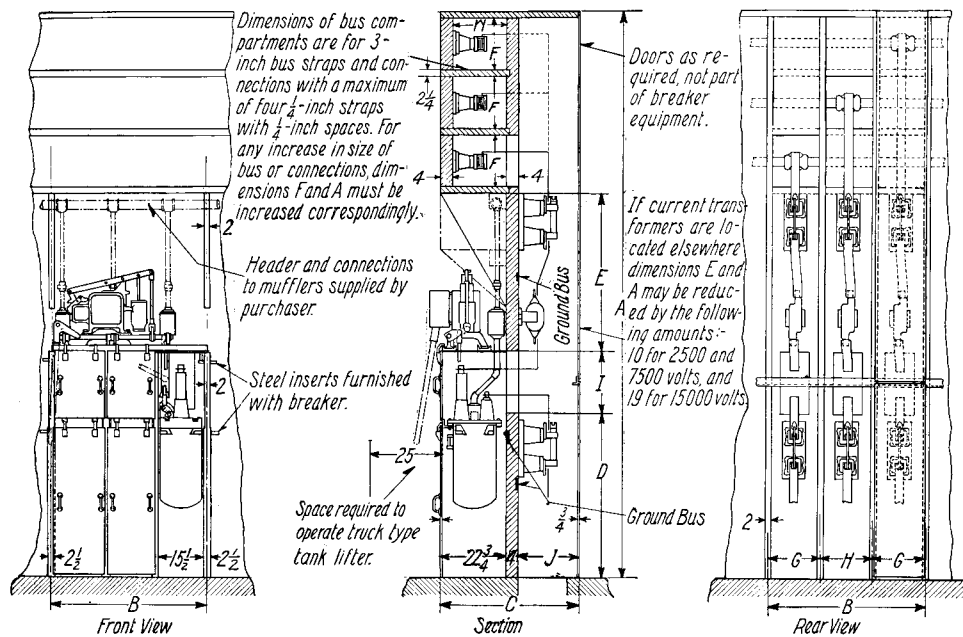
Complete Concrete Structure with Apparatus Installed.
